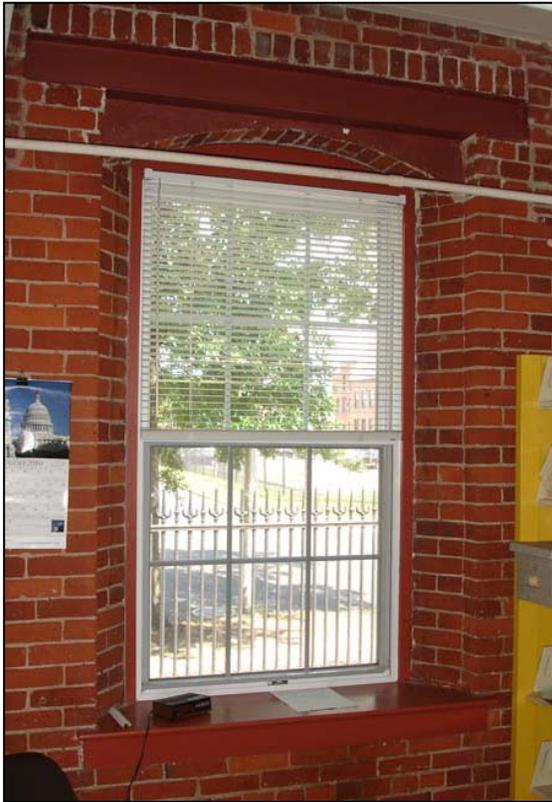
Building 27 first story, Room 122, east-wall window, 2010.
